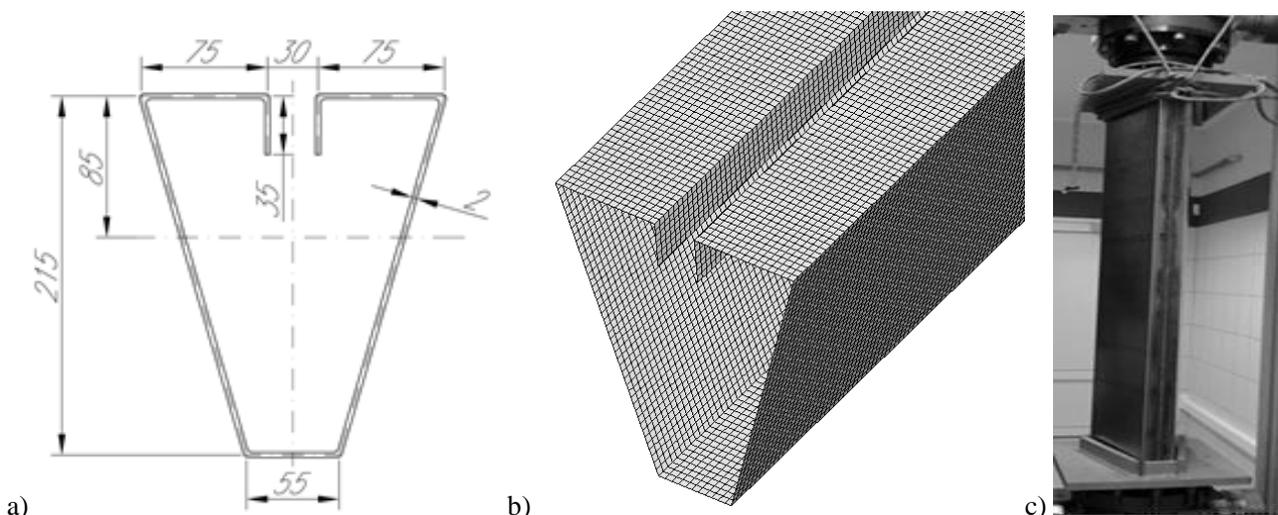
GEB section: a) geometric details, b) shell model detail, c) experimental set-up
